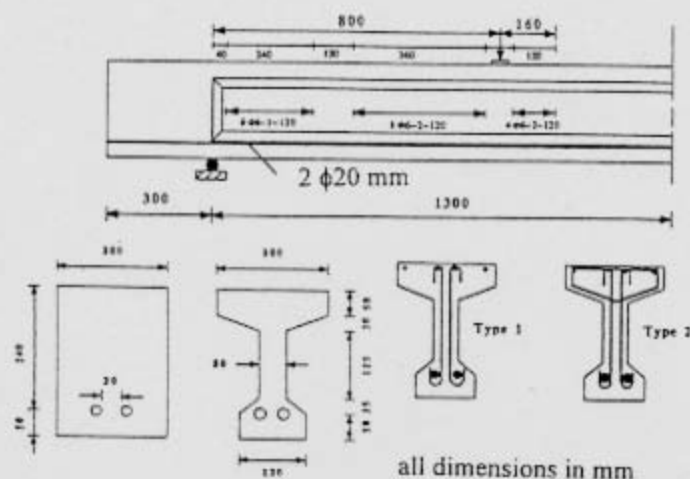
Case study 5. Dimensions and reinforcement detailing
